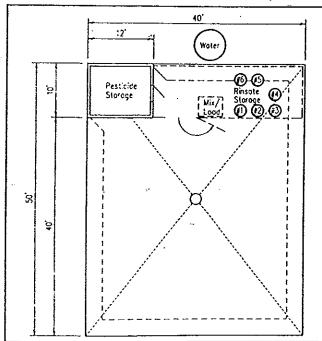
Rectangular single sump mixing/loading pad with storage building and fenced pesticide security area.
